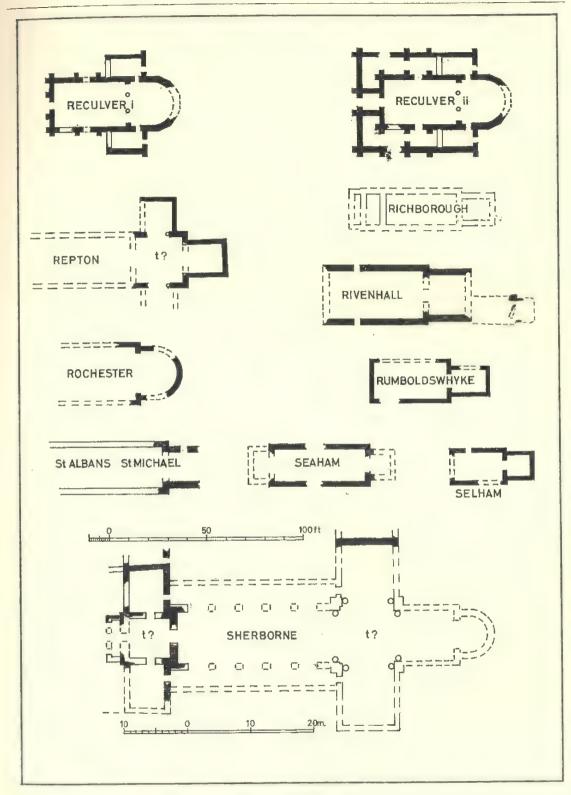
WELL DEFINED PLANS (7). RECULVER TO SHERBORNE
